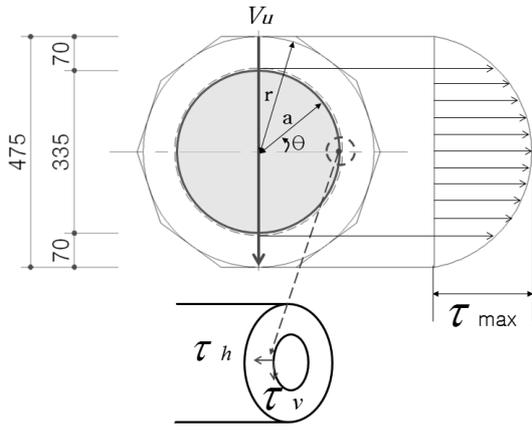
Conception image for calculating horizontal shear strength between filling concrete and HPC pile interface
